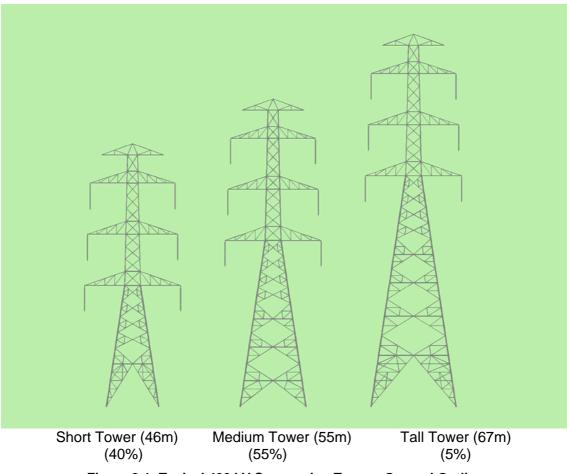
Typical 400 kV Suspension Towers General Outline
